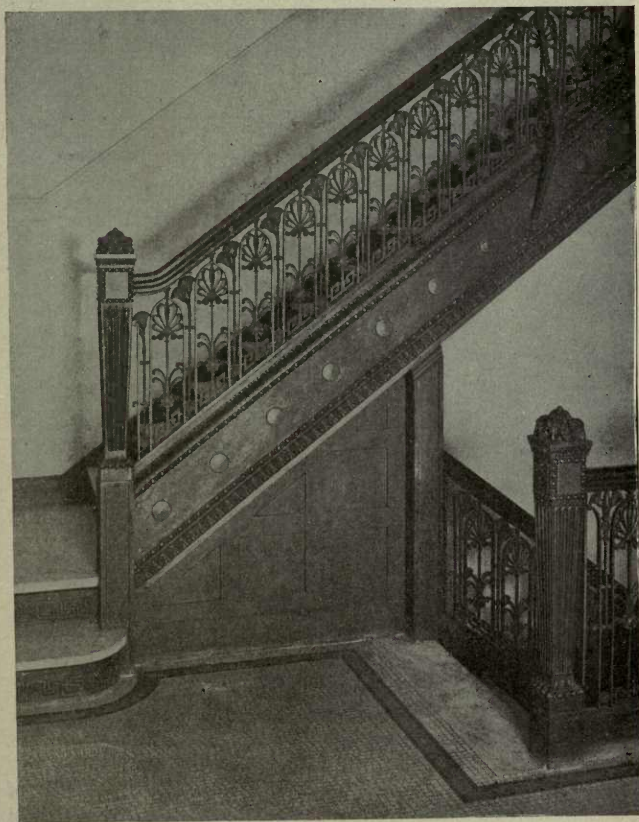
Closed Cast-iron Strings, Stairs in Central National Bank, N.Y.
